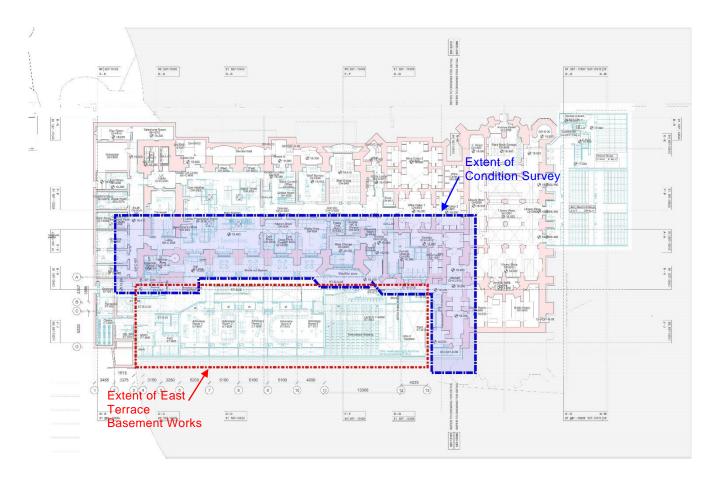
Proposed Basement Developments Plan Drawing - Rick Mather Architects
